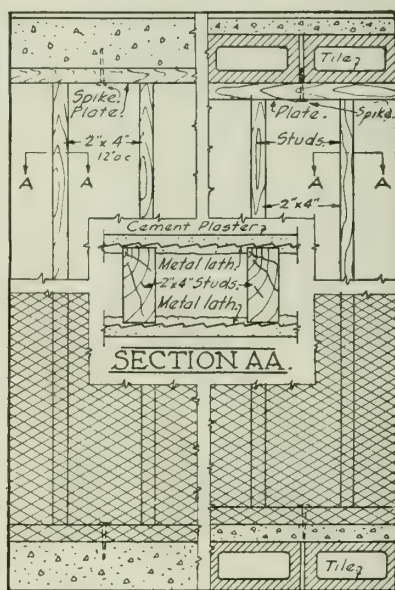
HOLLOW WALL WITH METAL LATH ON WOOD STUDDING
